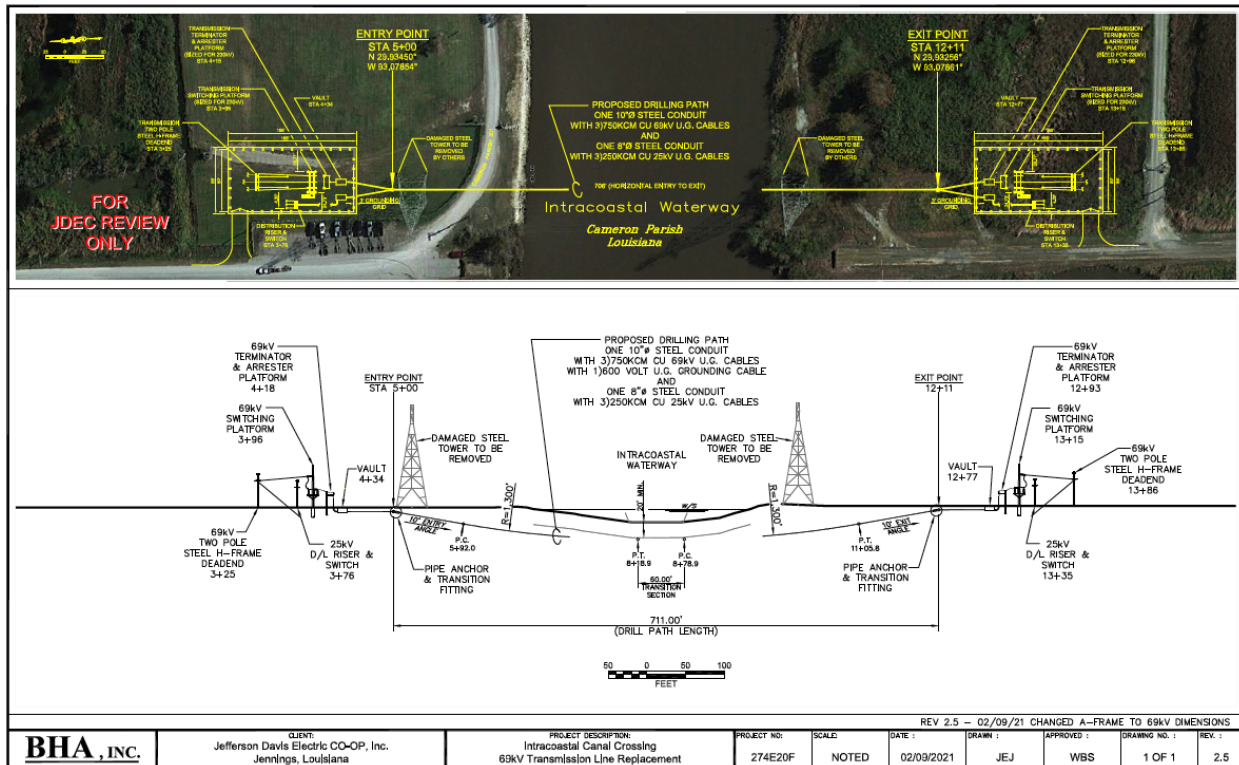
Intracoastal Waterway Crossing – Aerial View and Cross-section of Boring Design, with Previous Locations of Destroyed Towers.
